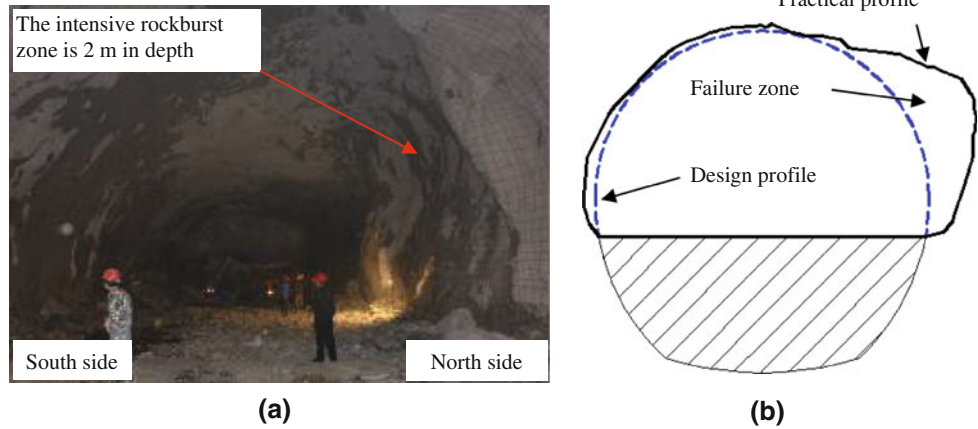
The extremely intense rockburst from the south arch foot to the sidewall of the headrace tunnel #4: a the scene photo; b the sectional profile
